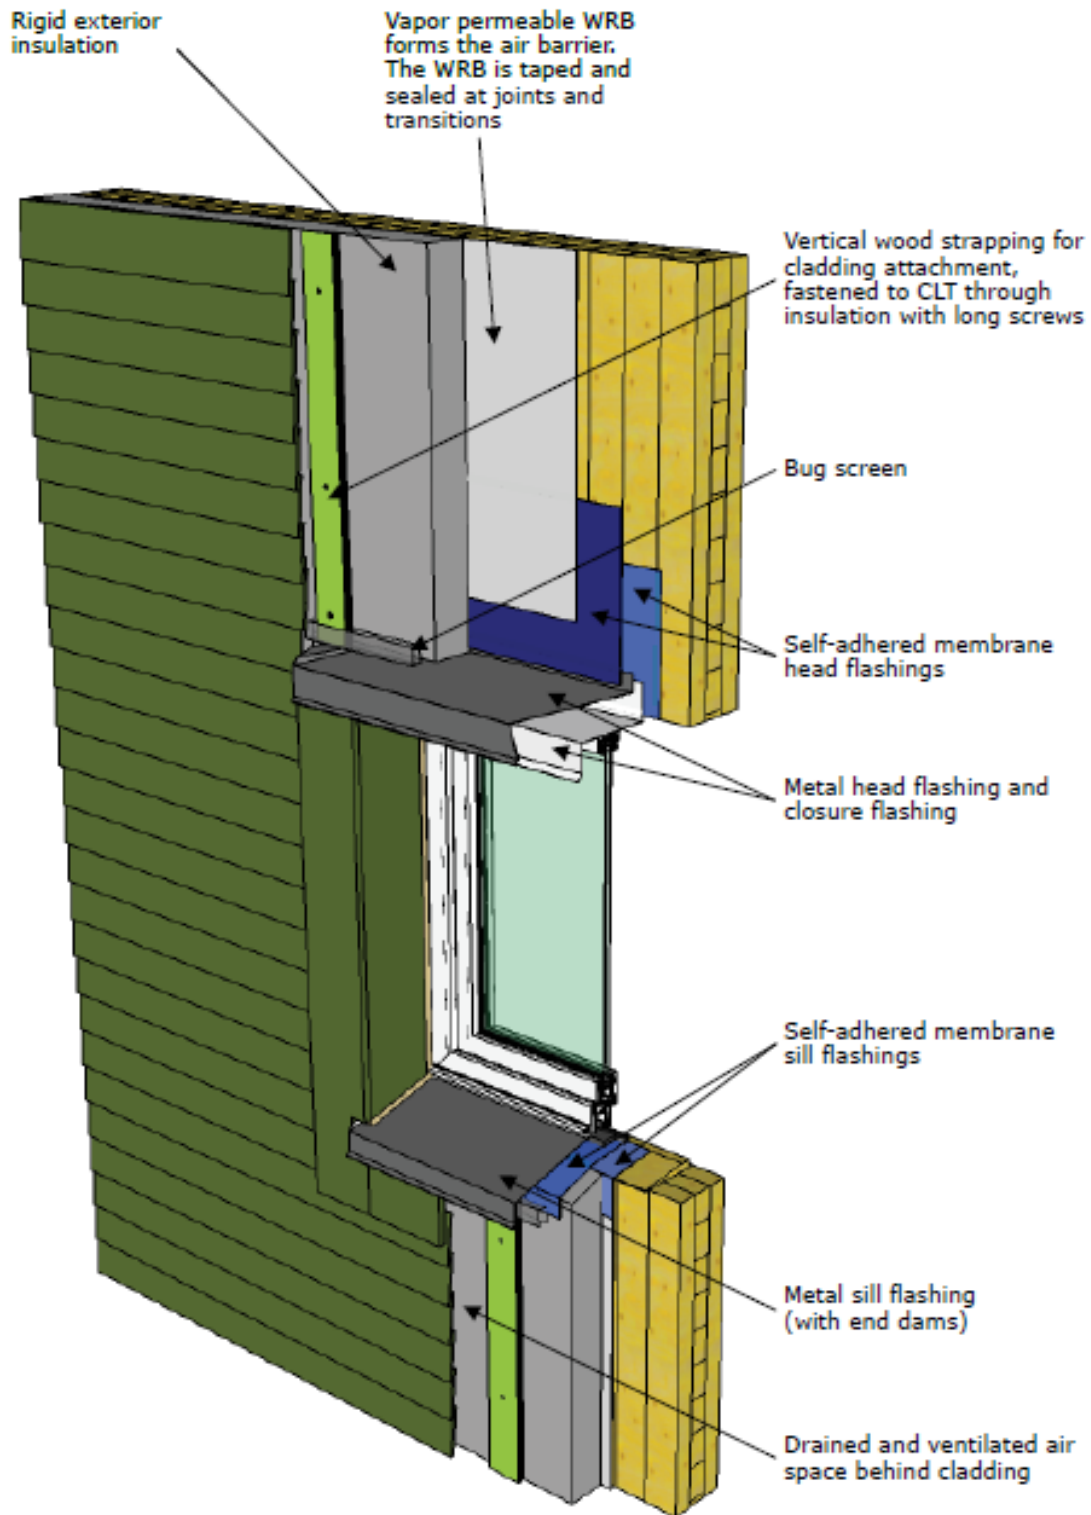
CLT exterior wall assembly with exterior insulation and ventilated cladding, showing material sequencing and schematic window flashing details (Glass et al., 2013). Courtesy of FPInnovations
